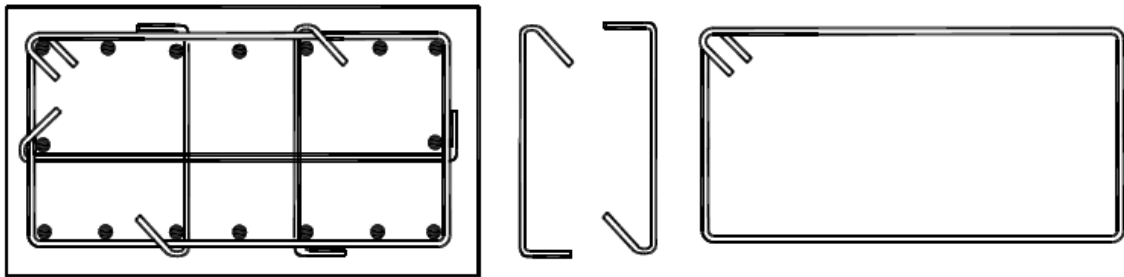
Tie bar placement in respect of new regulations (TEC-2018)
